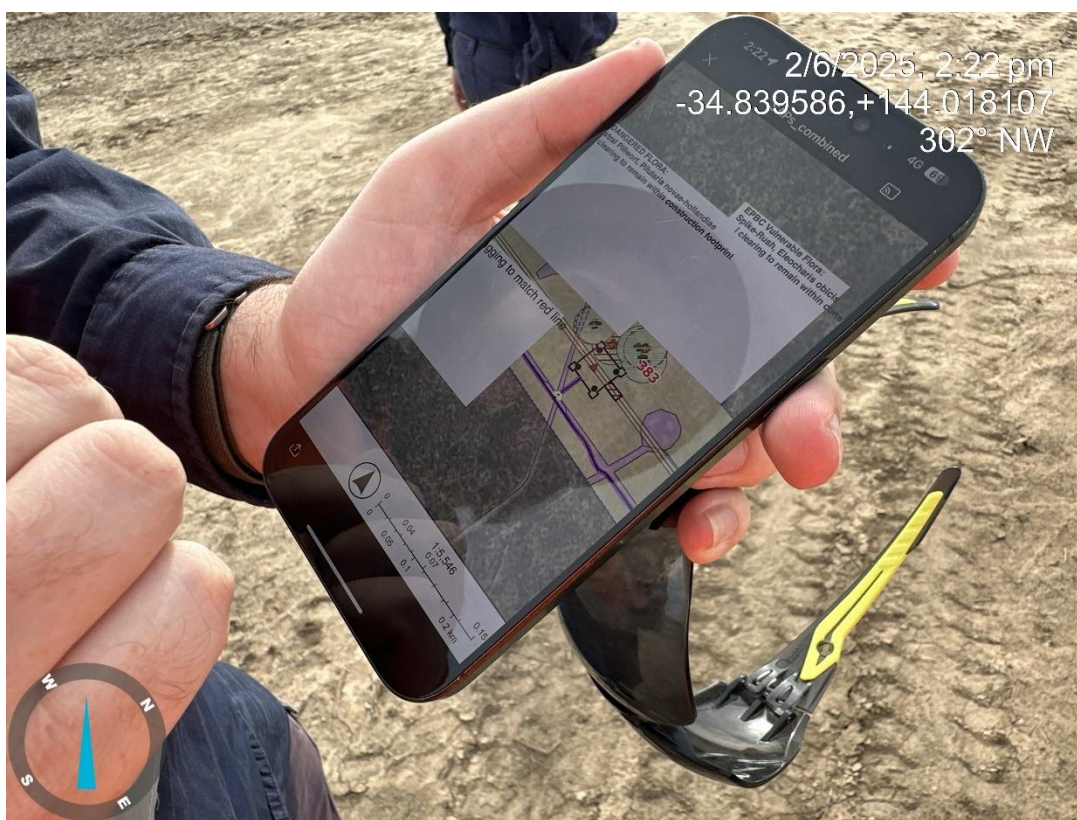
Construction pad for stringing activities over the Sturt Highway
